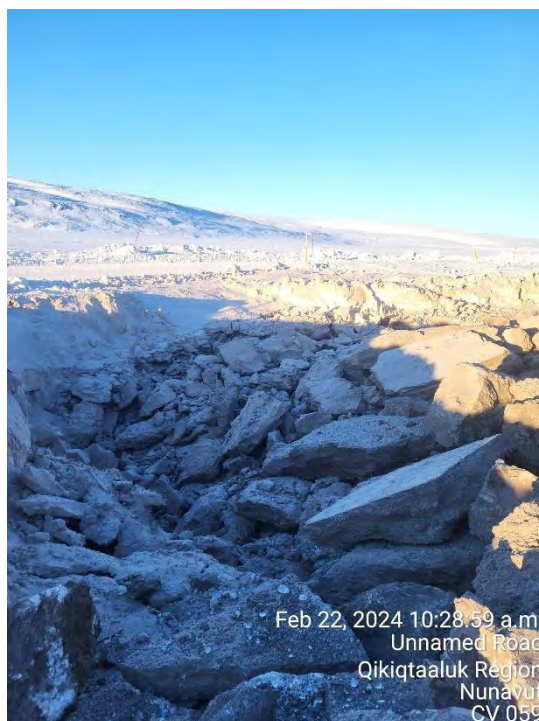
CV-059 looking northwest at the blasting excavation in the area of the culvert outlet (February 22, 2024)
